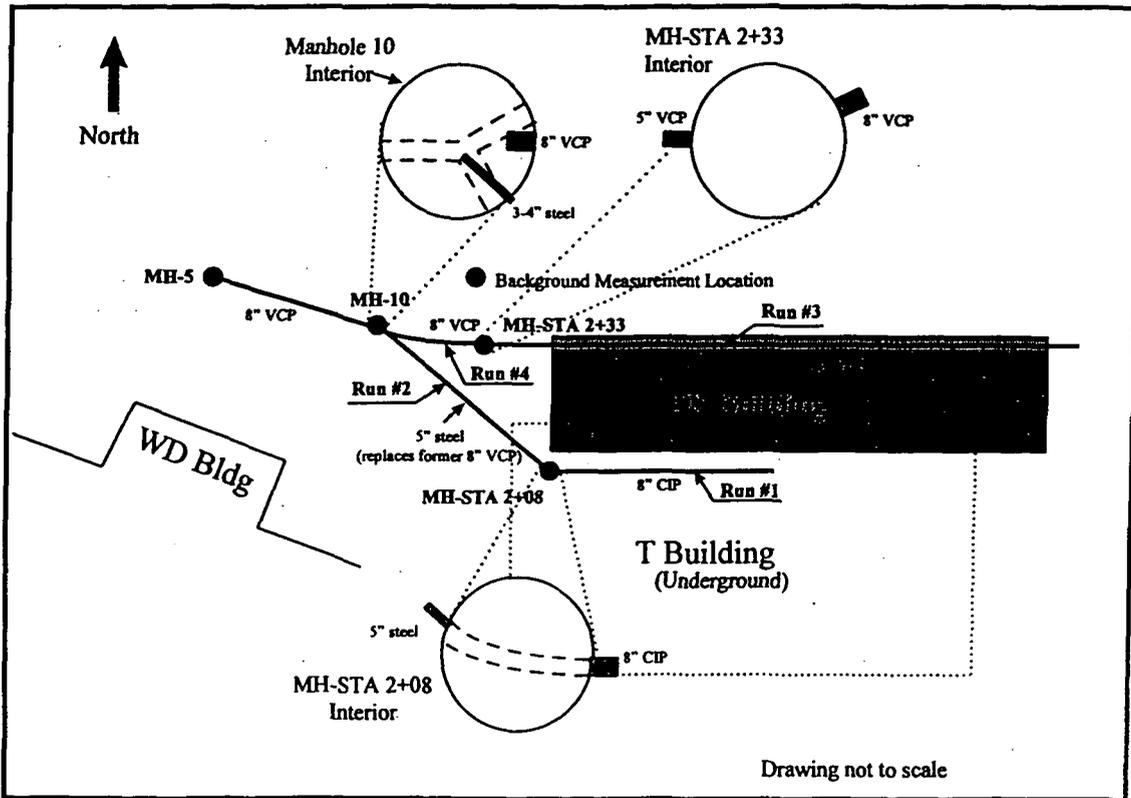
Sketch of the pipe segments surveyed showing the access manholes and Run #'s.
